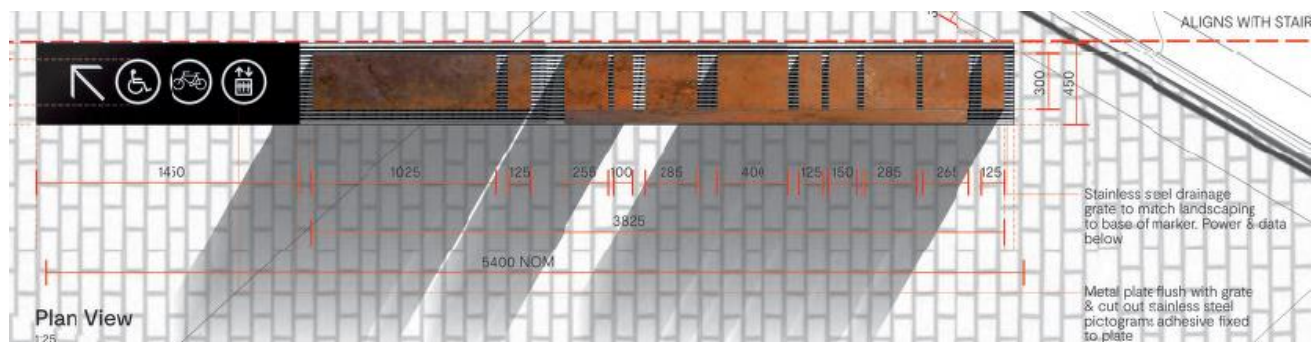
Plan view of the Redfern Station sign with proposed stainless steel grate and metal plate elements
